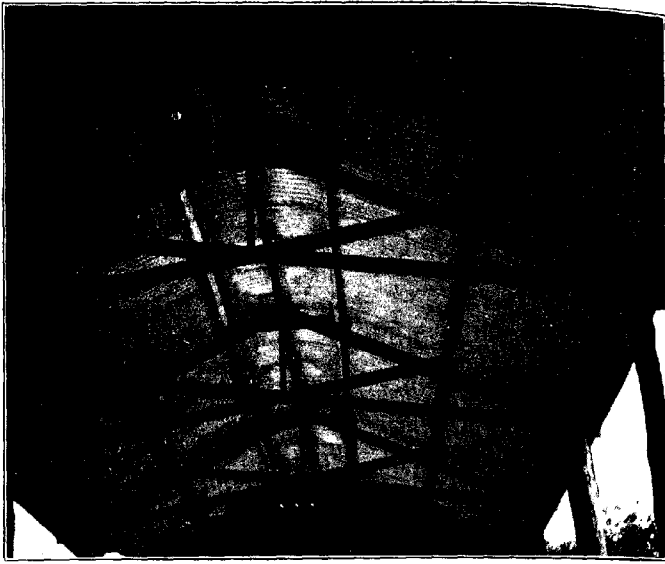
Dutch Barn at Papplewick Hall, Notts. Inside of Roof, showing trusses.
